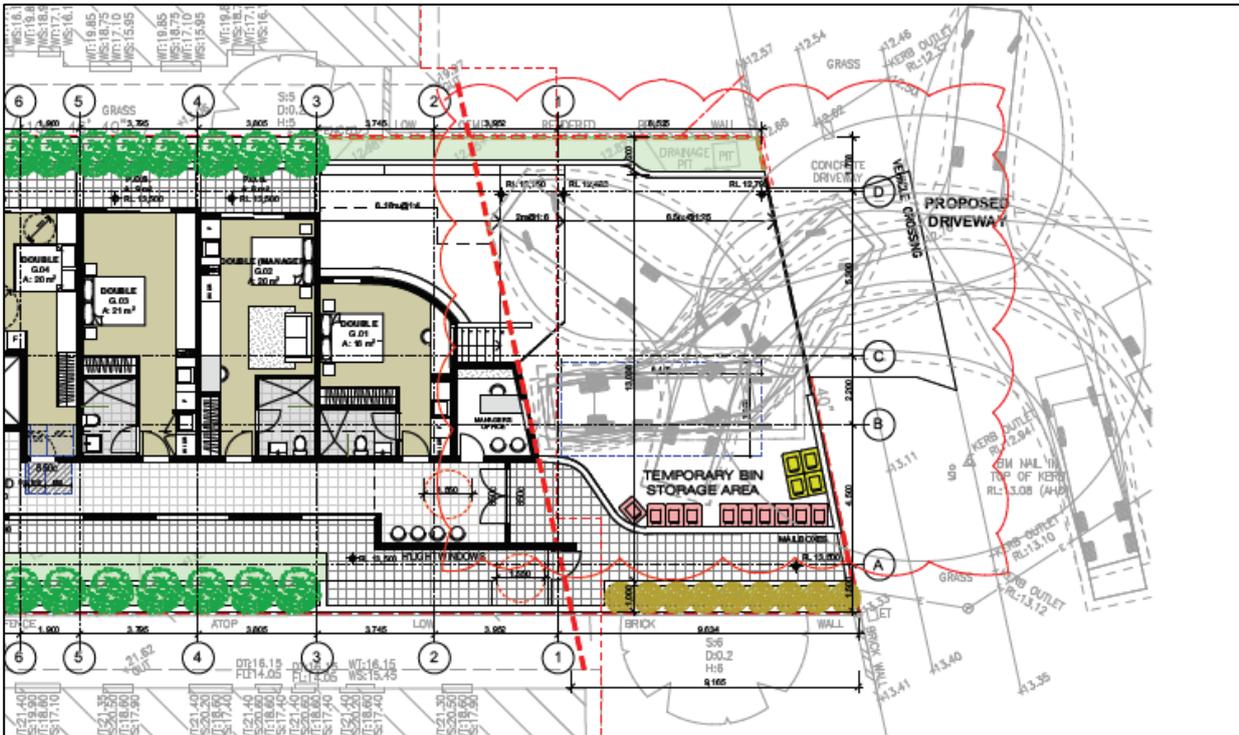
Proposed new ground floor plan demonstrating location of temporary storage area and at-grade loading bay.
